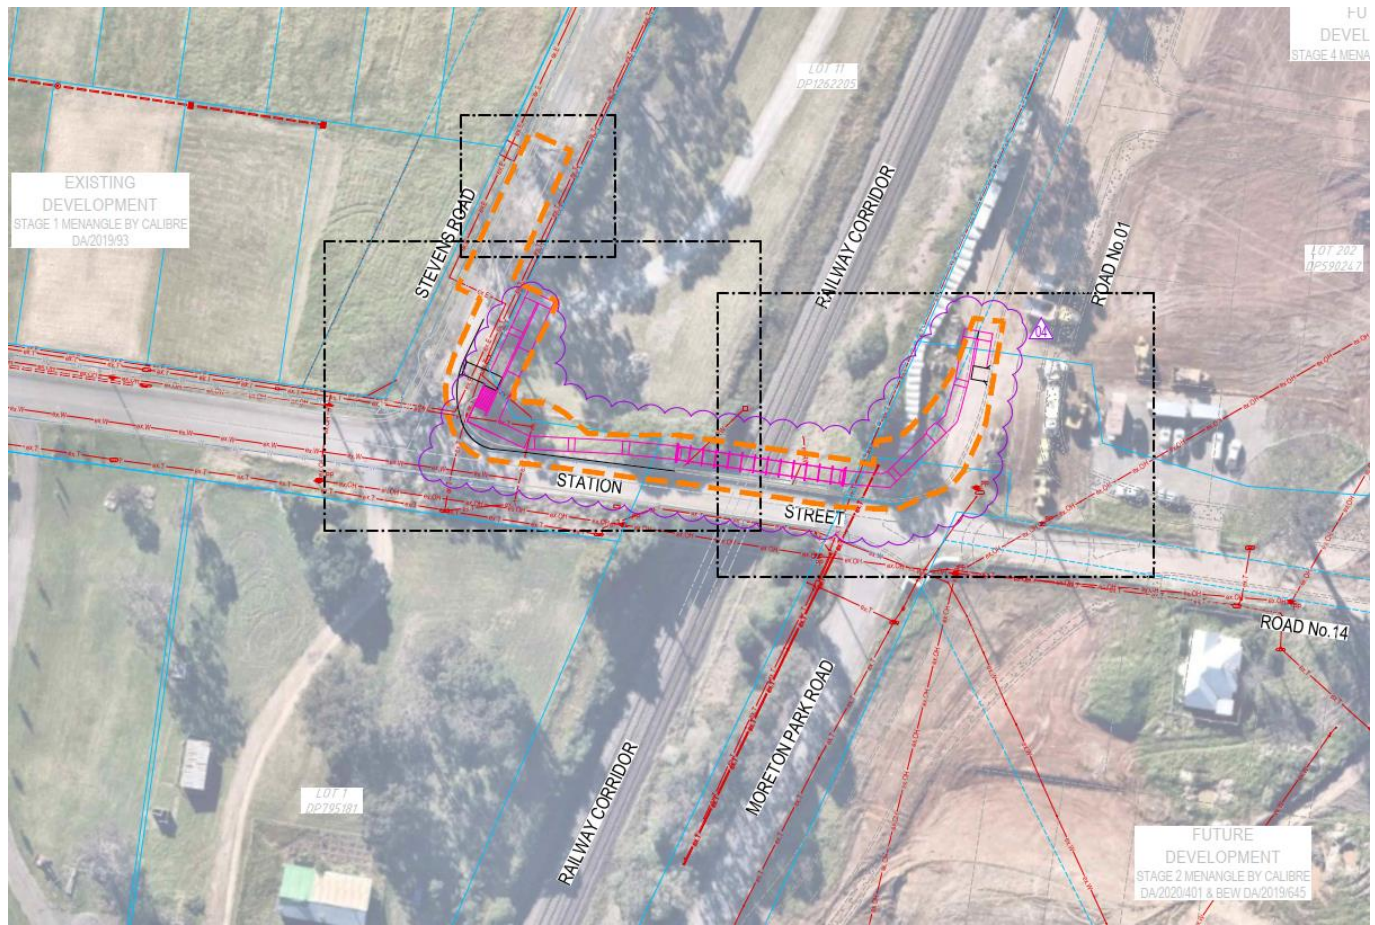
Pedestrian Bridge Crossing General Arrangement
